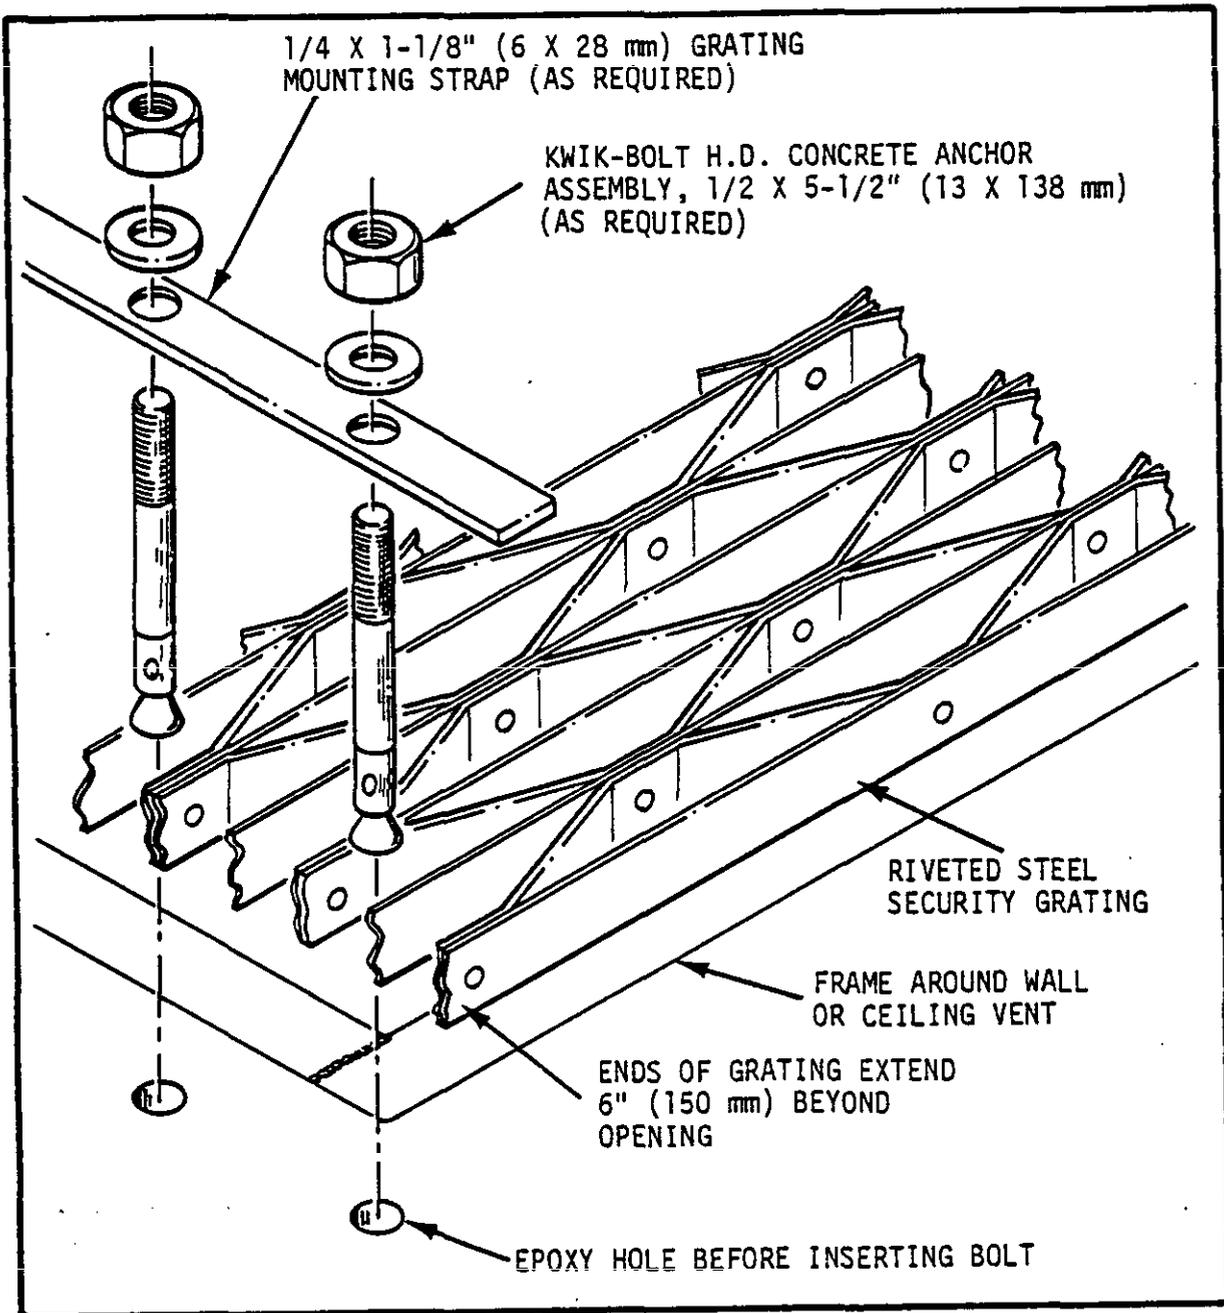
Security intrusion protection plan for hardening a typical wall or ceiling.
